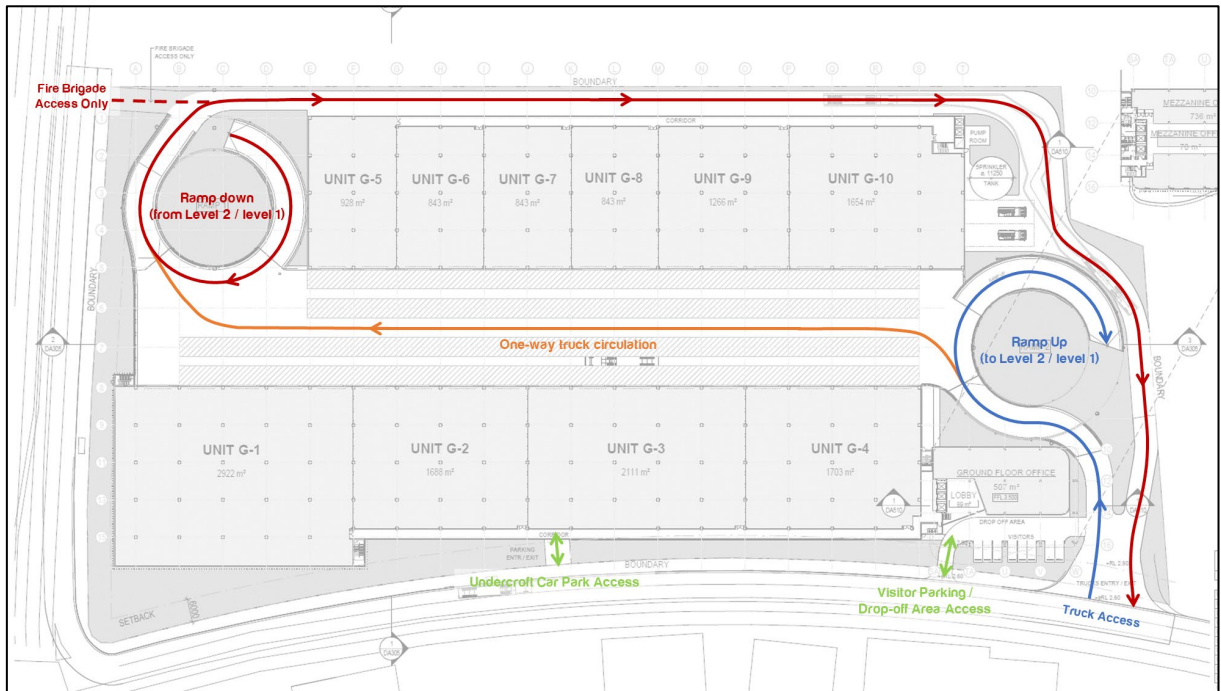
Heavy Vehicle Movement Plan (Ground floor)
